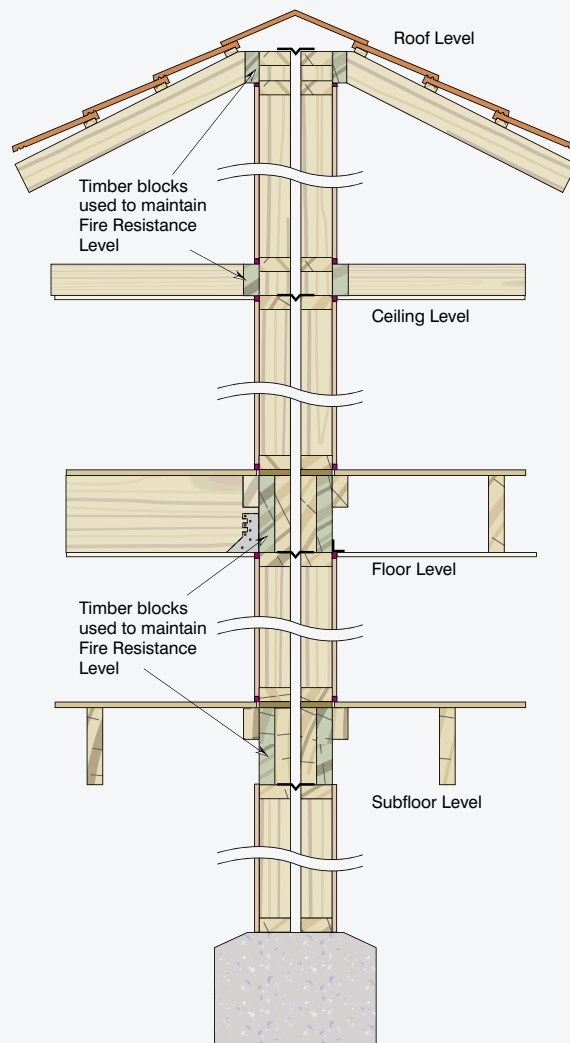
Common location of timber blocks that act as construction joints – elevation view.
